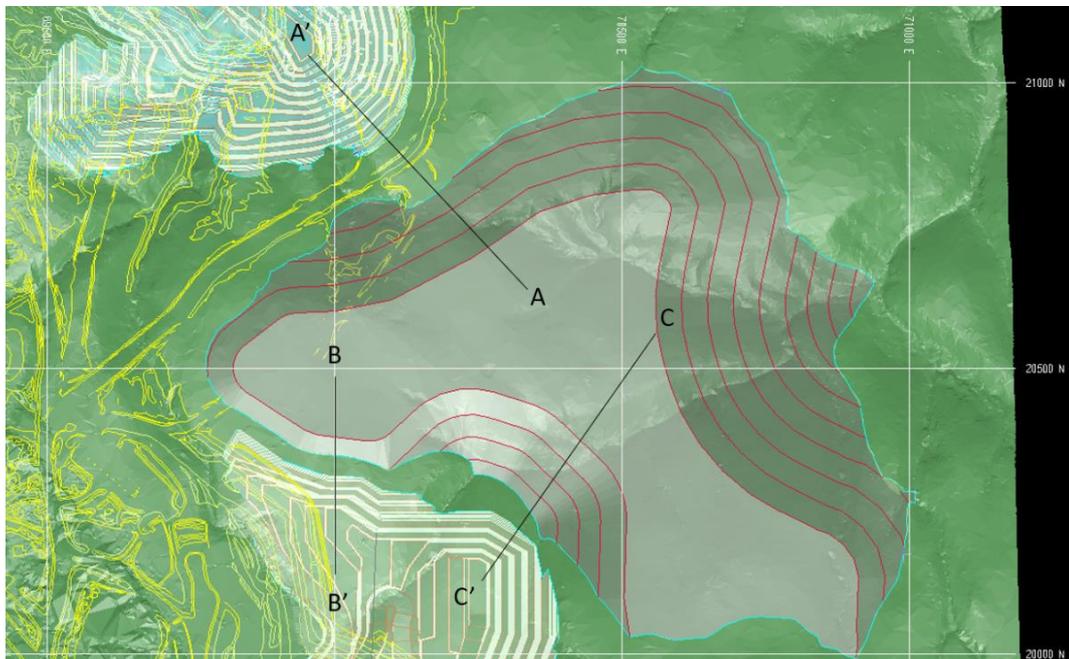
Plan location of the proposed Trimbles Waste Rock Stack, which lies between Coronation (south) and Coronation North (north) pits. Section lines are drawn.
